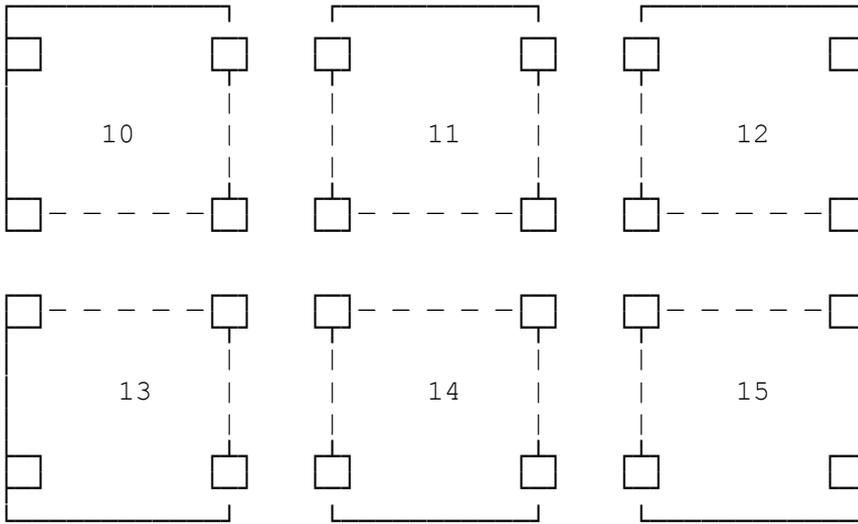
(b) - Flat slab panels with one cantilever edge
